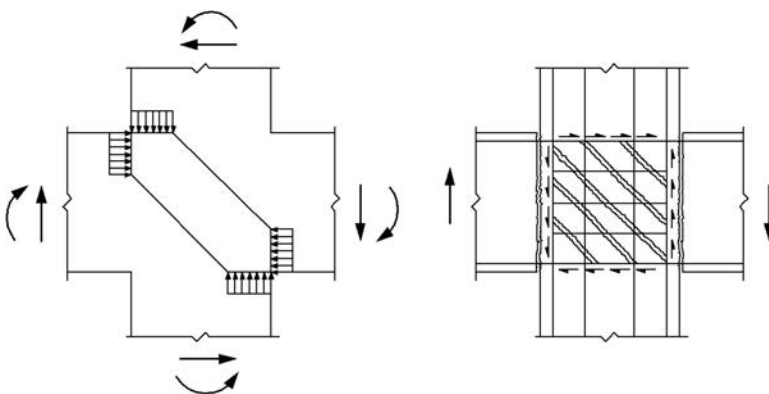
Shear transfer mechanisms in the interior beam column connection: (a) strut mechanism and (b) truss panel mechanism.
